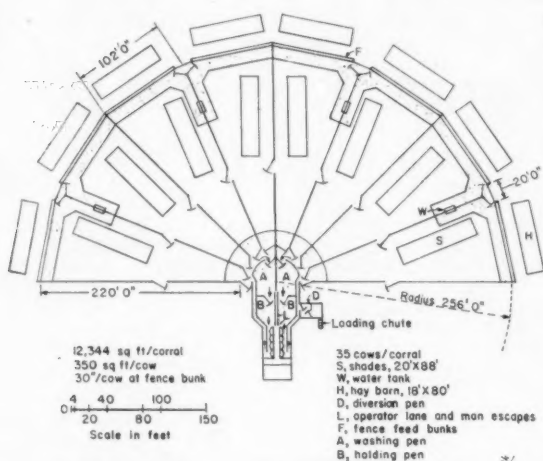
(Left) Pie-shaped corral layout showing relation to washing-holding pens for an elevated stall milking room
